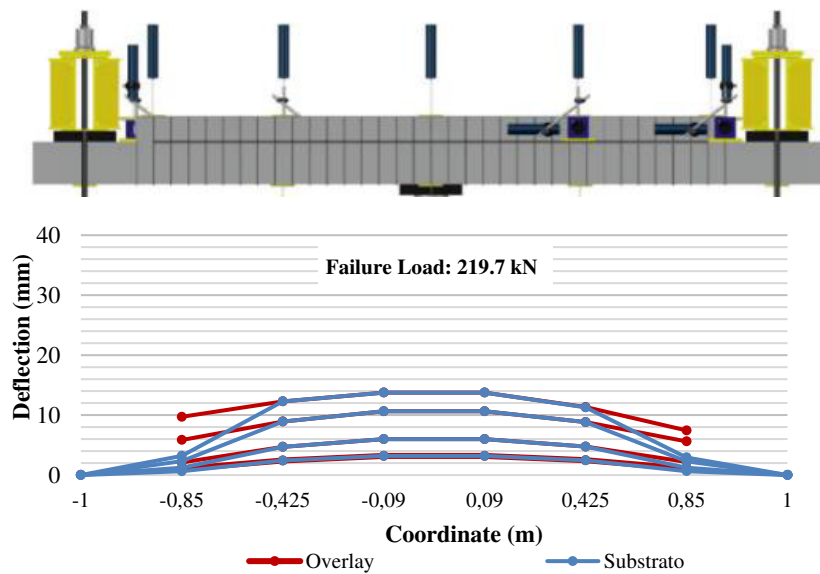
Relative deformation between concrete layers for the RL-STC specimen.
